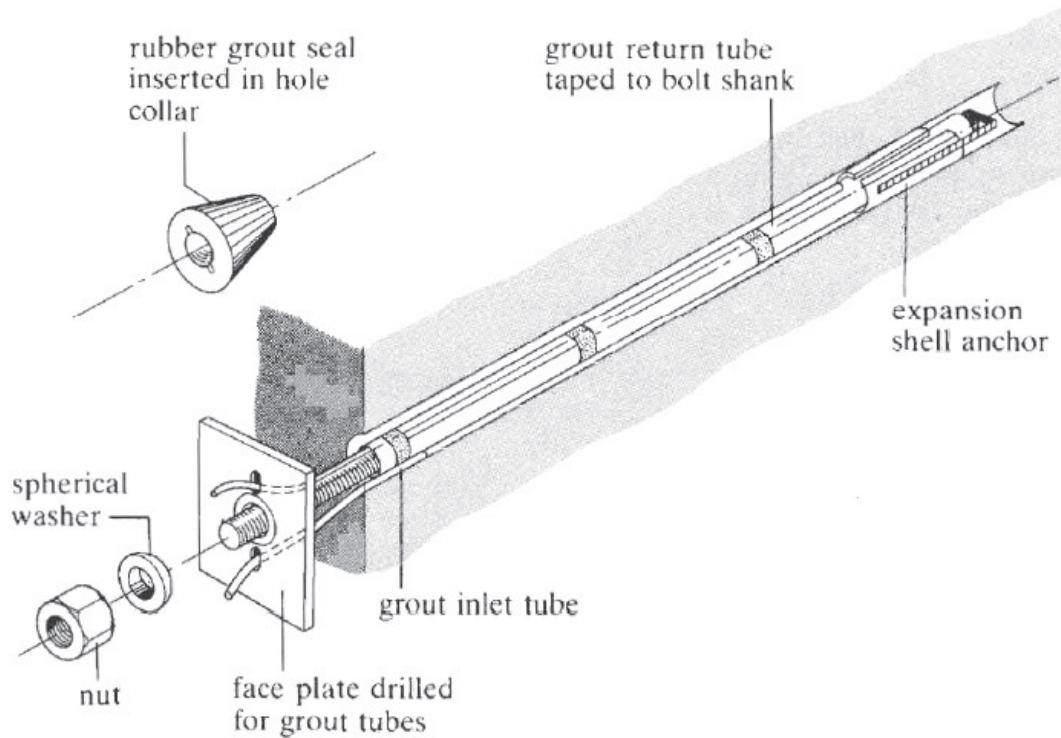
Rock bolt with an expansion shell anchor, tensioned and grouted (After Hoek & Brown 1980)
